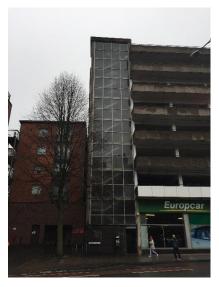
External views of stairwell Views illustrating façade glazing, stair units, structural frame and brickwork
